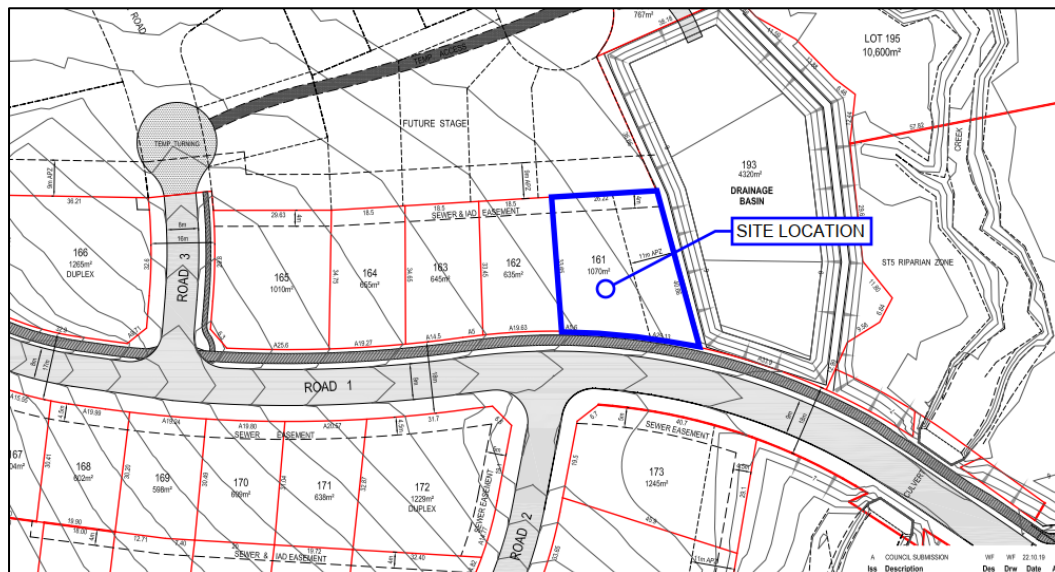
Site Location (Source: CivilTech Drawing 1002-SP7 A)
